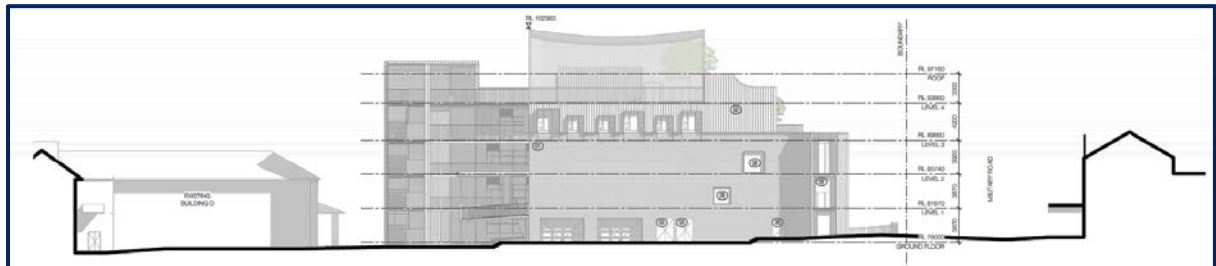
| Proposed Building G – southern elevation (Avenue Road) (Source: Applicant's RtS, 2021)
